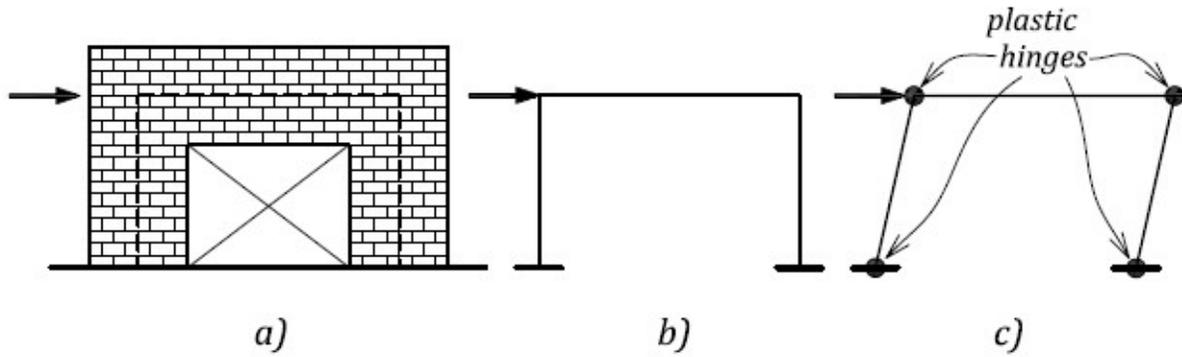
An example of a plastic collapse mechanism for a frame system: a) perforated masonry wall; b) frame model; c) plastic collapse mechanism.
